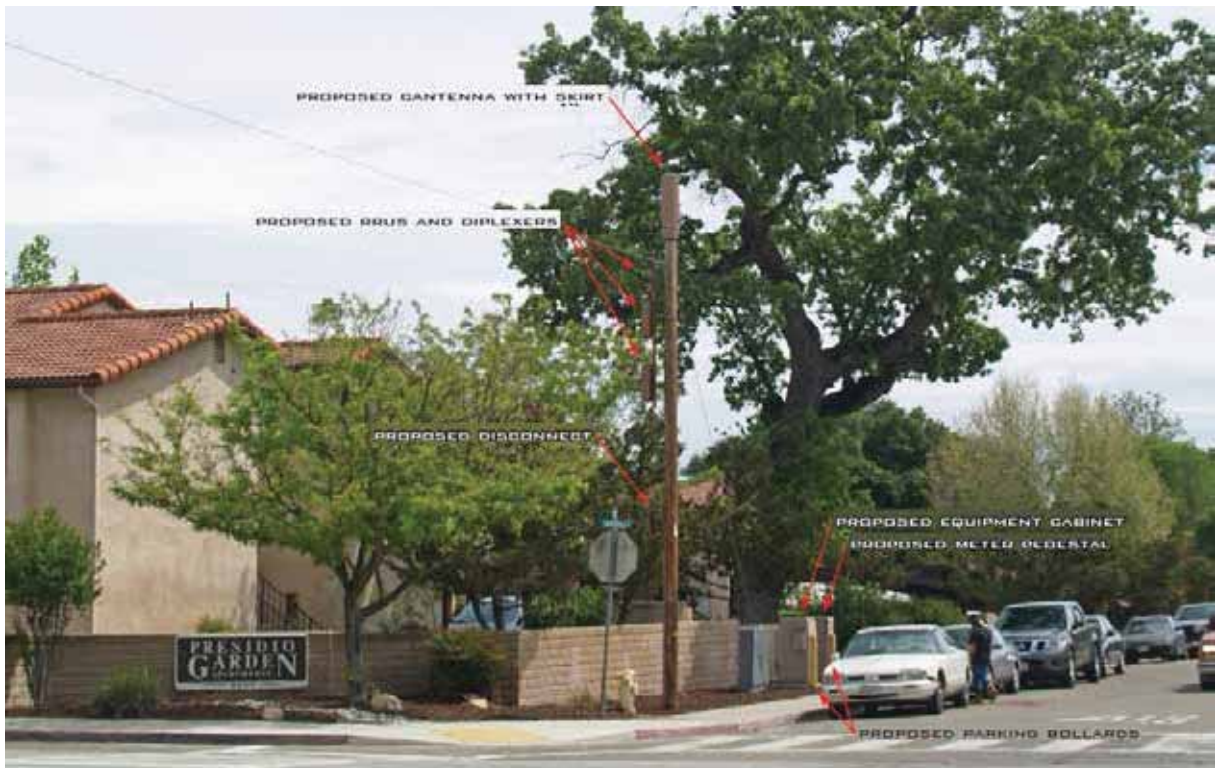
Looking east from Spring Street. Cabinets are not enclosed.
